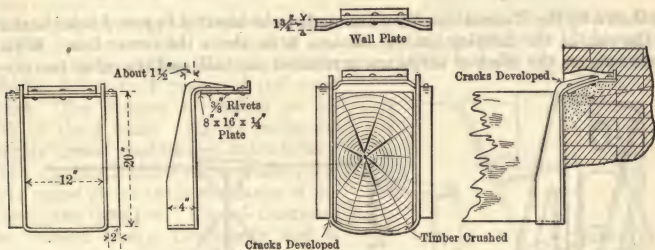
Failure of Steel Stirrup Wall-hanger
